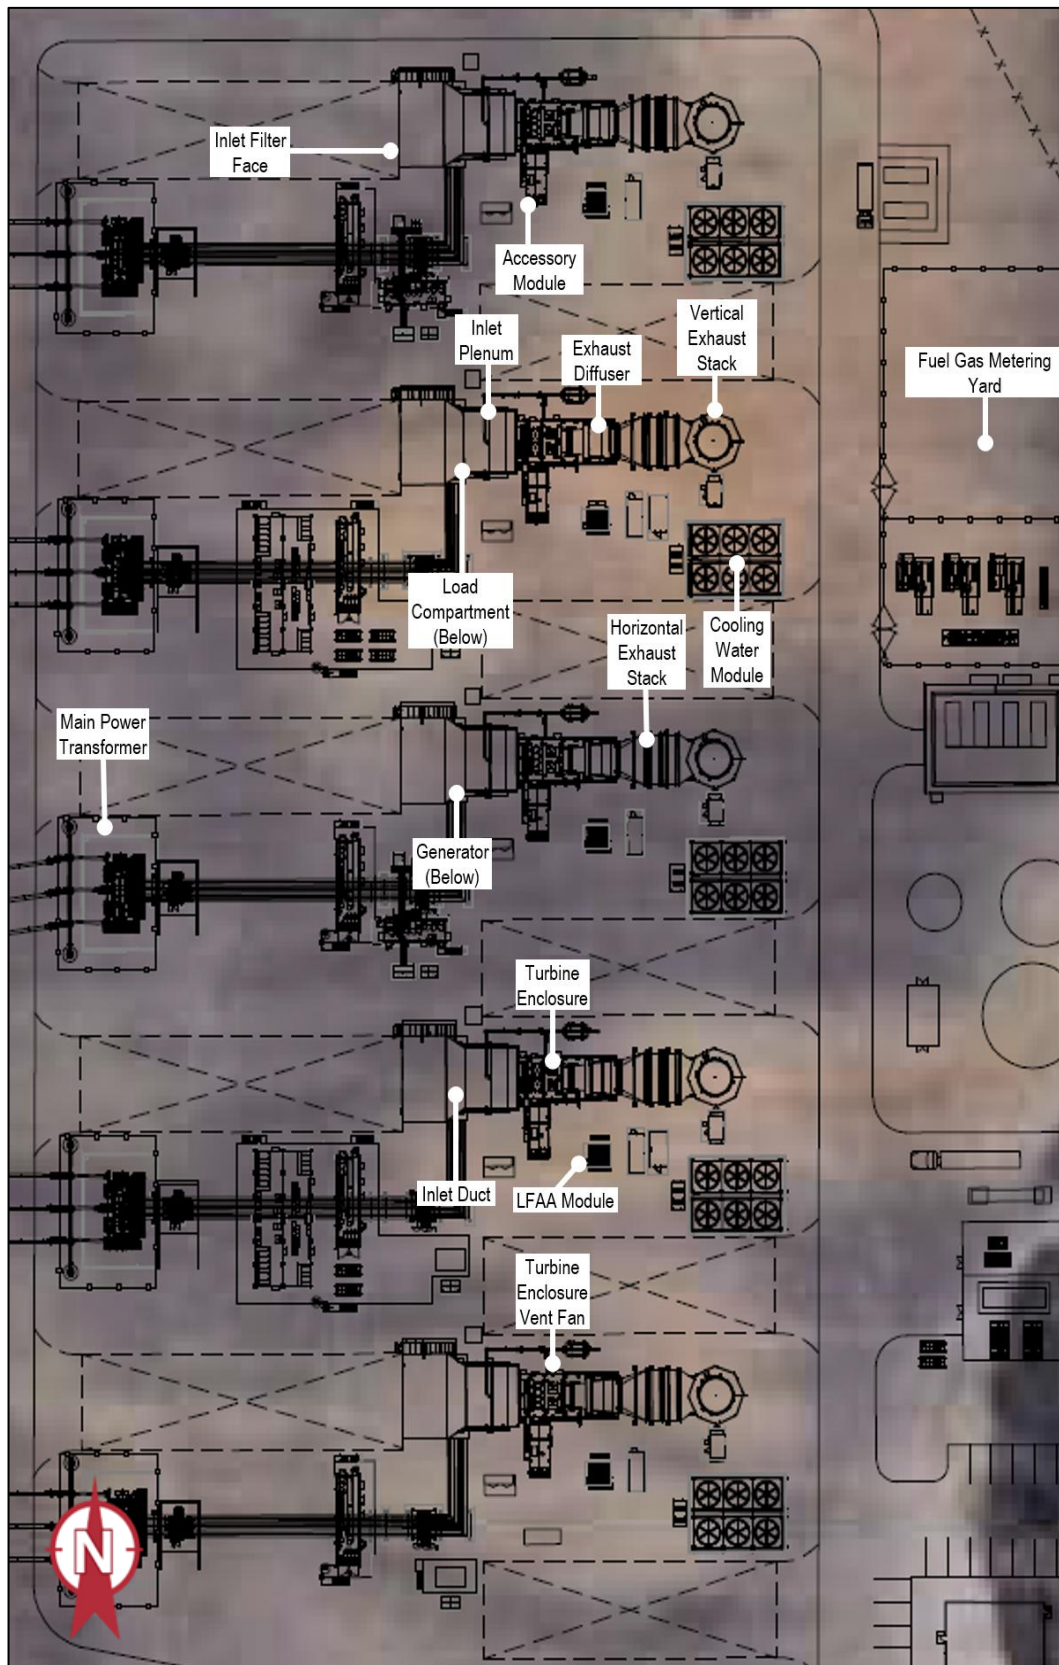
Proposed Site Plan and Noise-Producing Equipment
